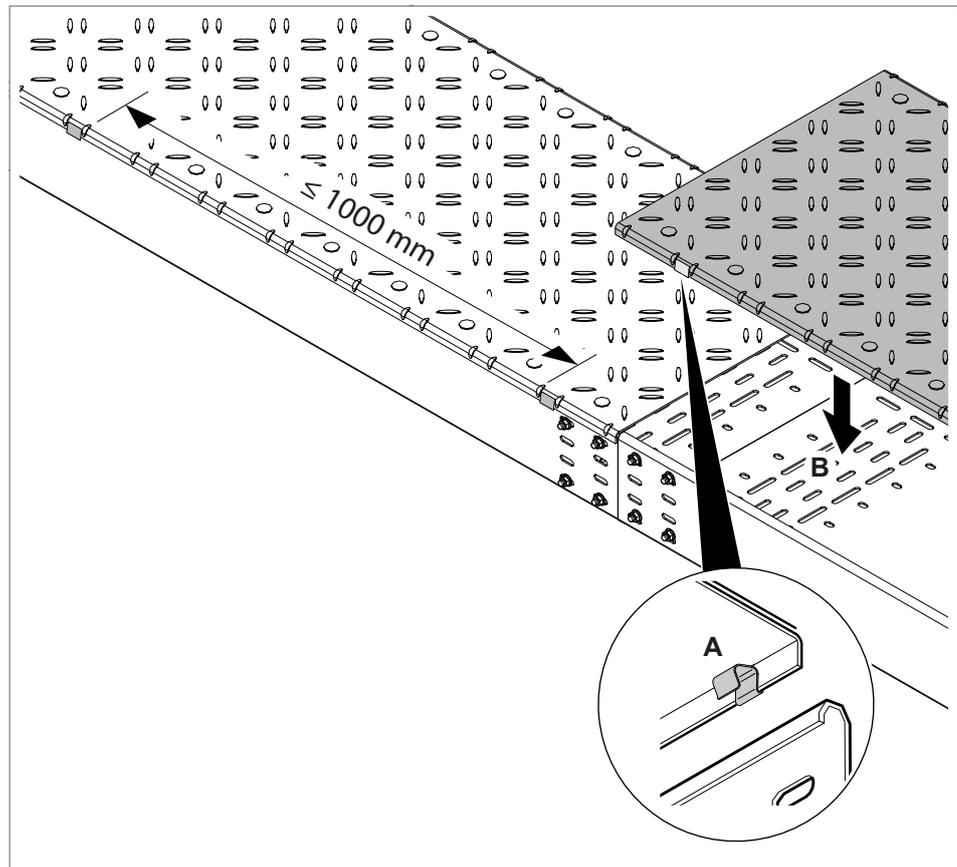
Mounting the cover, type DBKR, with cover clamps
